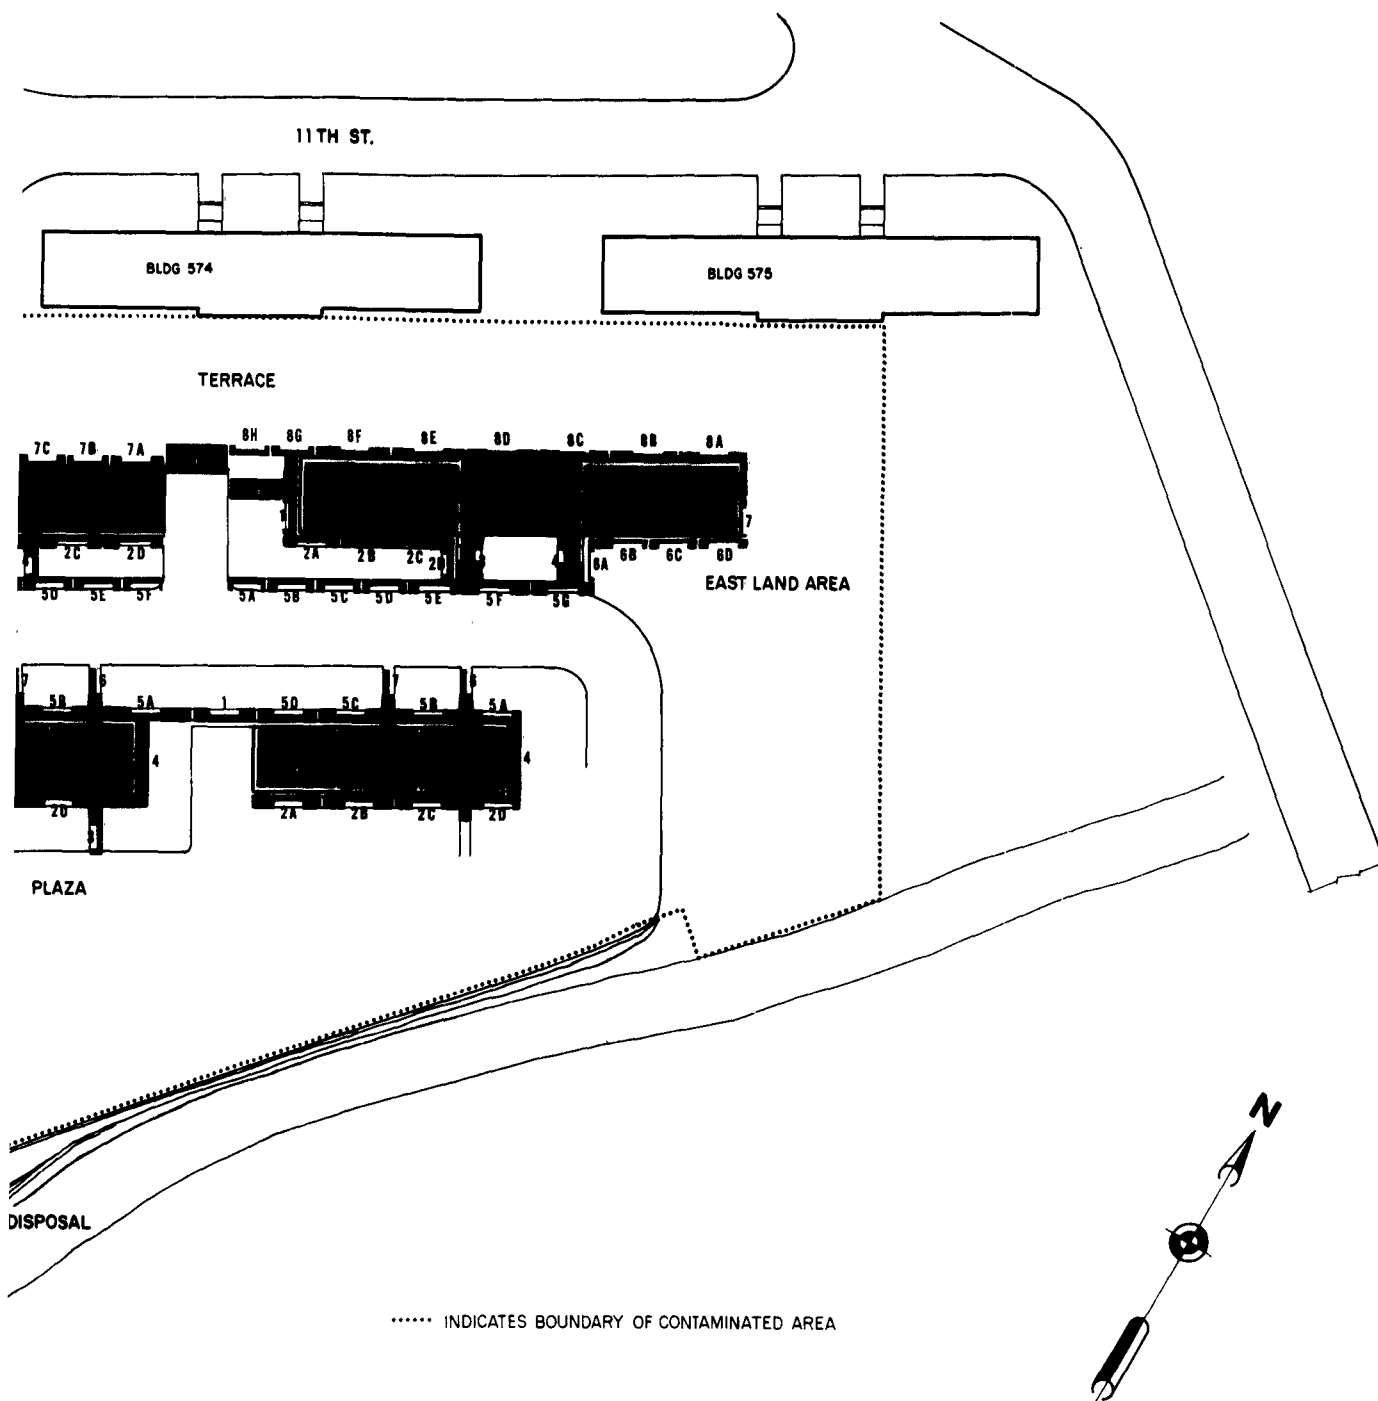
Layout of Tar and Gravel Roofs and Paved Walks
